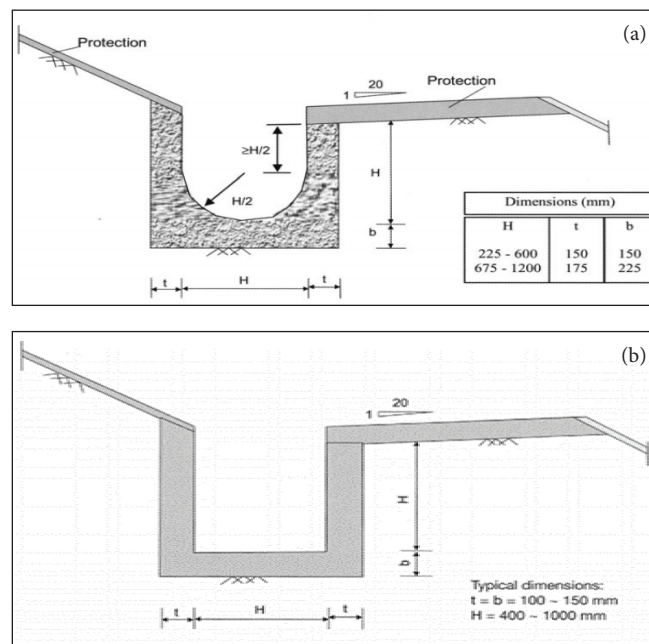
Concrete slope drainage structures: (a) U shaped concrete ditch, (b) Rectangular concrete ditch
